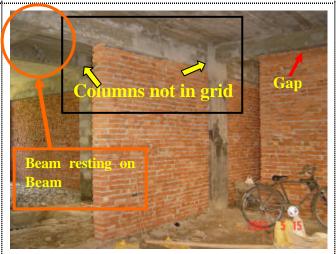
The structural system and load path of the new building is not proper. The columns are not in grid, beams are just connected with beams and there is a lack of columns. Improper connection of infill walls with the frame has made the infill walls more vulnerable.
